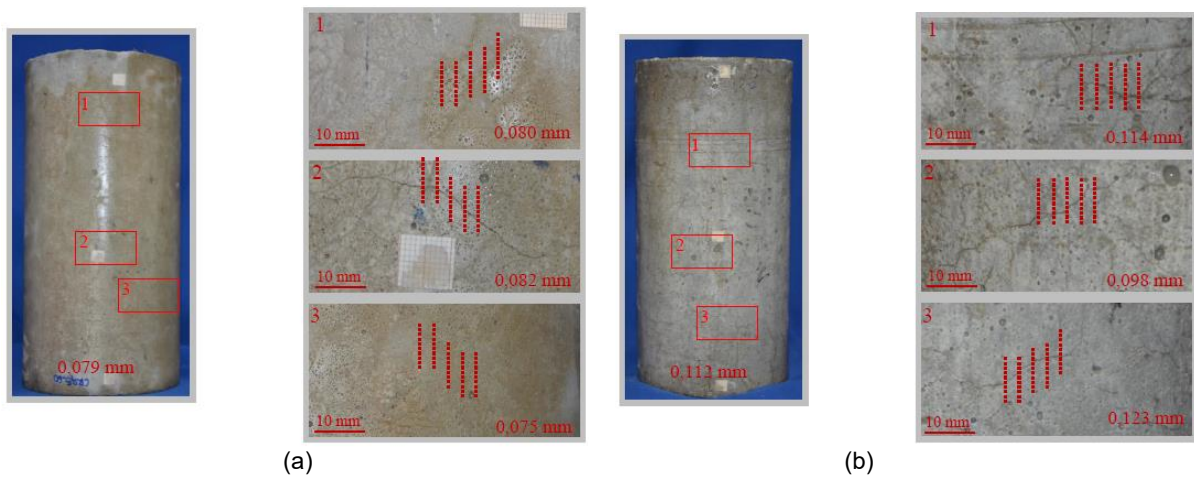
Typical cracking at 365 days: (a) FC\_0.5\_60; (b). FC\_1.0\_60
